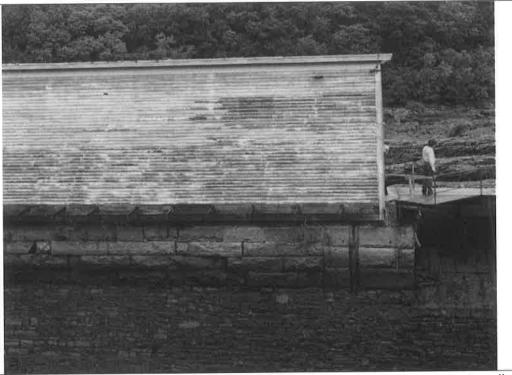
Deteriorated / missing sill and missing siding boards at eastern end of north wall; entire building has settled in this area, as evidenced by the downward curvature of the siding boards under the left-most window.
